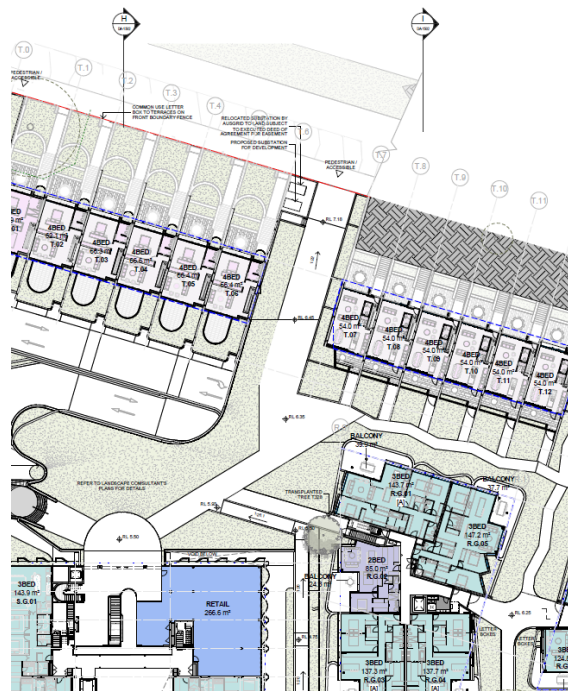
Extract of ground floor plan showing primary pedestrian entry to the site
